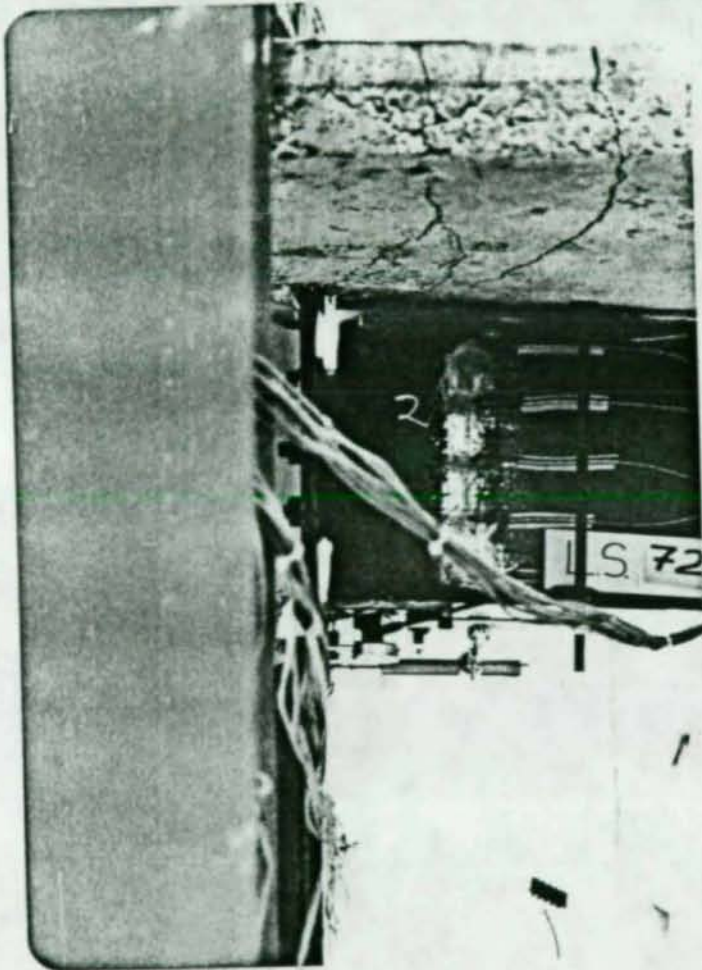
Right connection at the end of GL4. Note that the bottom bolts have sheared, and the beam flange is bearing against the column flange
